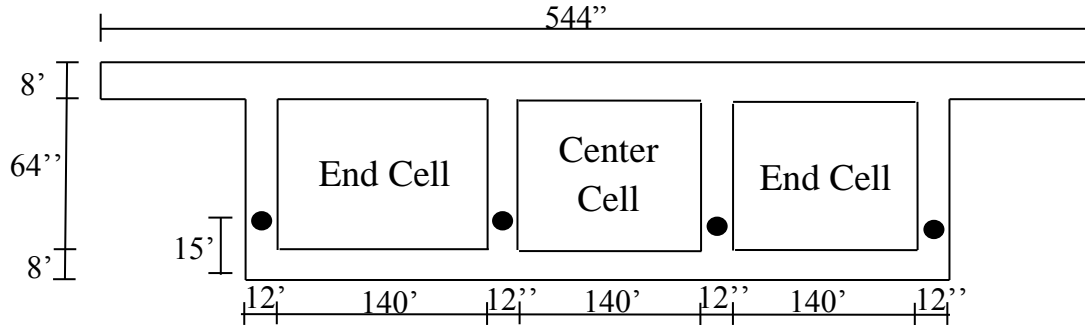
Bridge cross section with concrete dimensions (section A-A)
